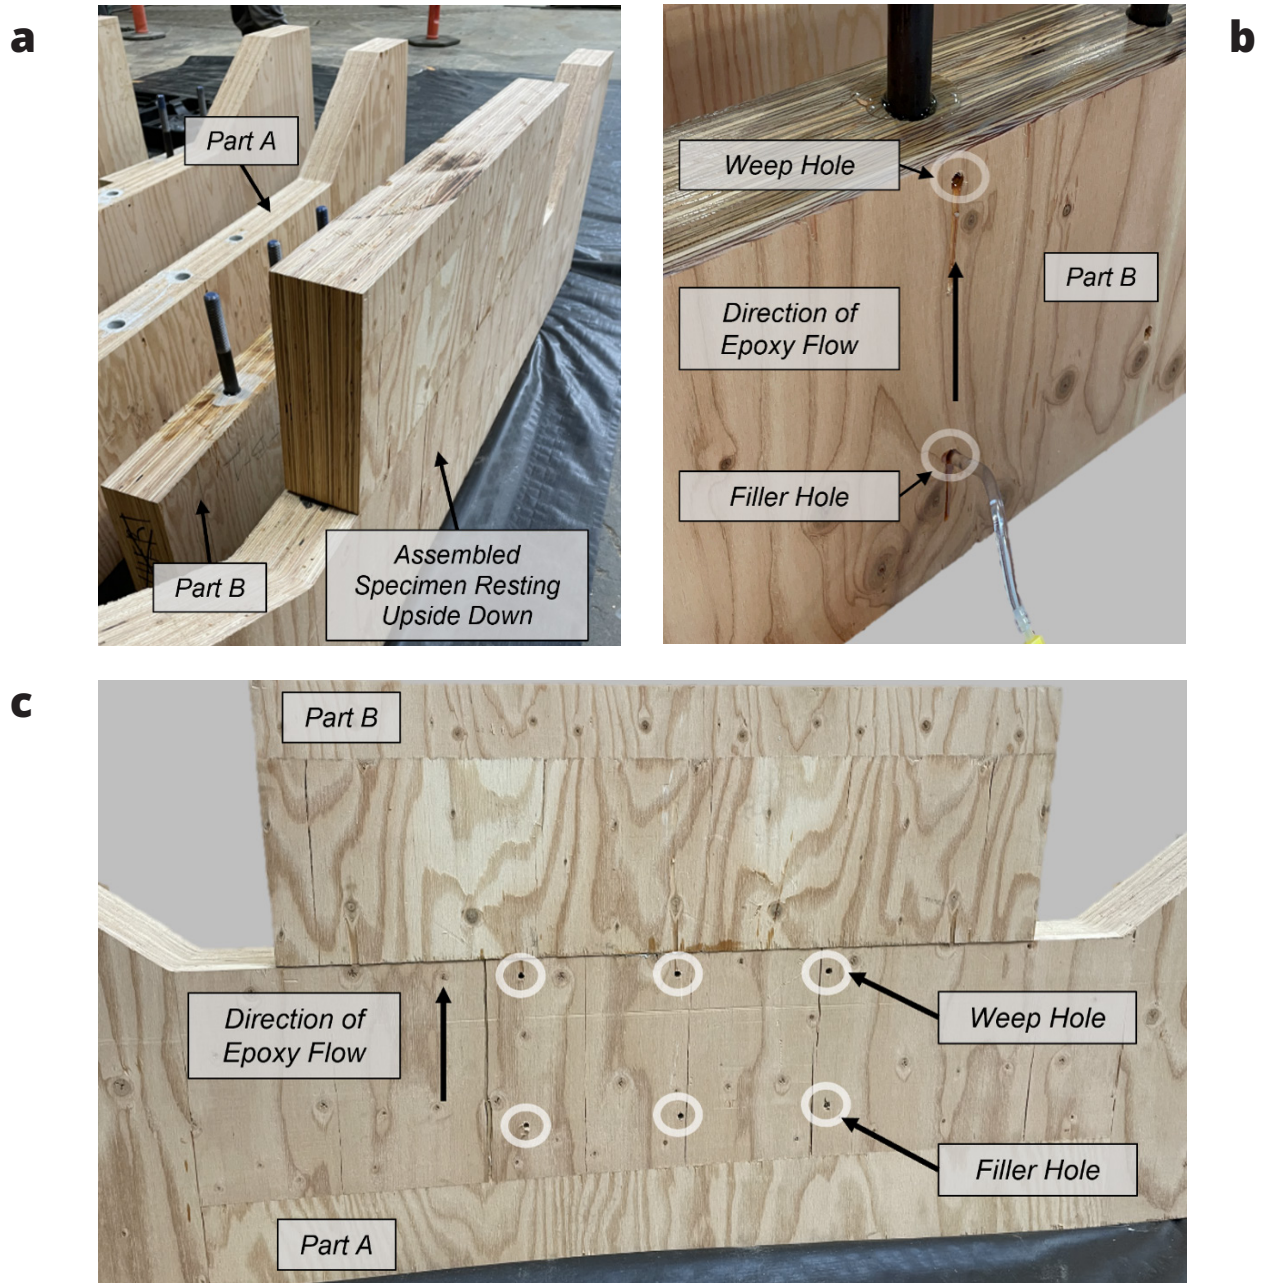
Specimen fabrication process: (a) Part A with first coat applied to the holes, Part B with rods installed, assembled specimen resting upside down relative to specimen geometry in Figure 3; (b) filler and weep hole in Part B; (c) filler and weep hole and direction of flow for Part A.
